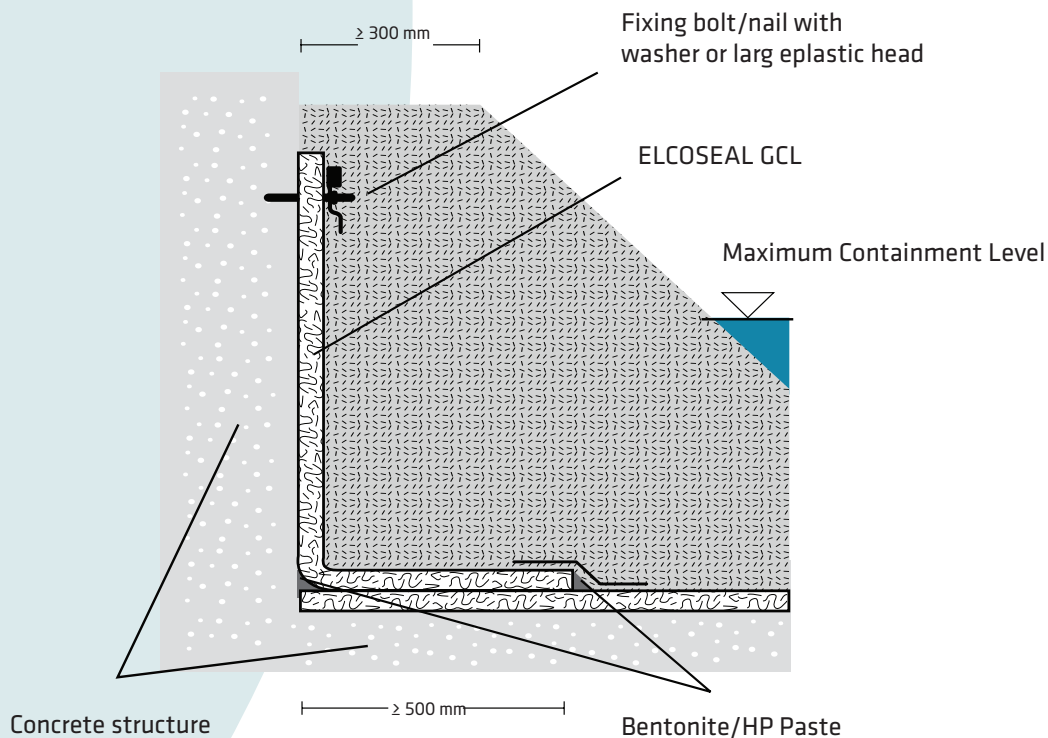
Typical connection to a concrete structure where the ELCOSEAL panel if required to extend above the maximum containment level
